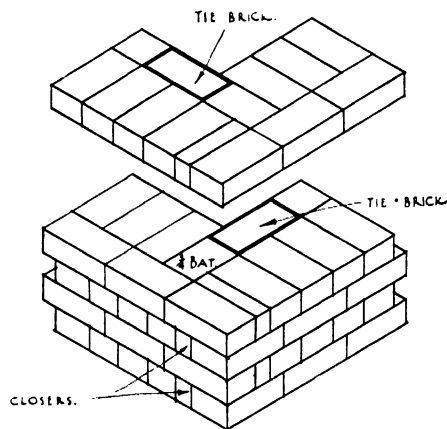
ONE AND A HALF BRICK WALL, IN ENGLISH BOND
